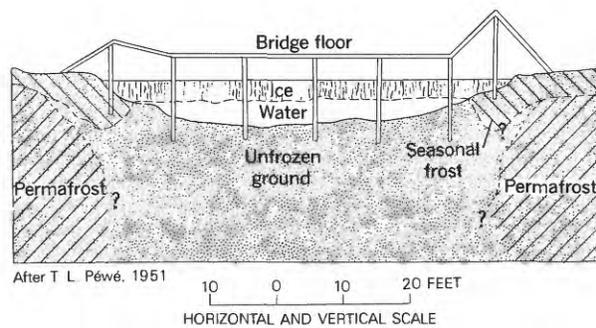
Geologic sketch of foundation conditions of frost-heaved bridge, 8 miles southeast of Big Delta. Compare with figure 30. After Pévé and Paige (1963, p. 349).
